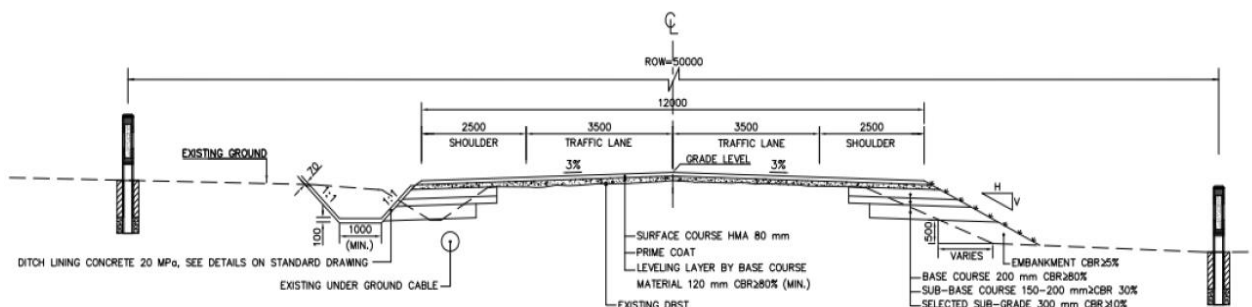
Typical Cross Section of Approach Road New Bridges
